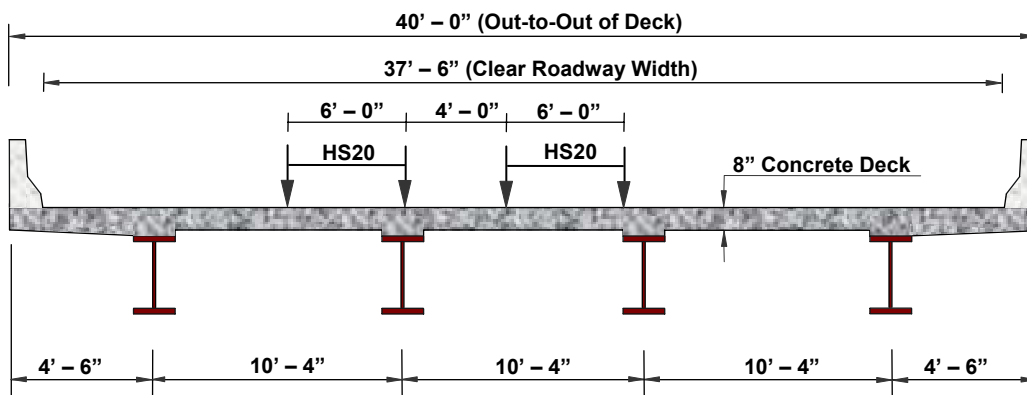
Cross-section view and horizontal loading positions for all bridges included in the WVU parametric study for cross-section 2
